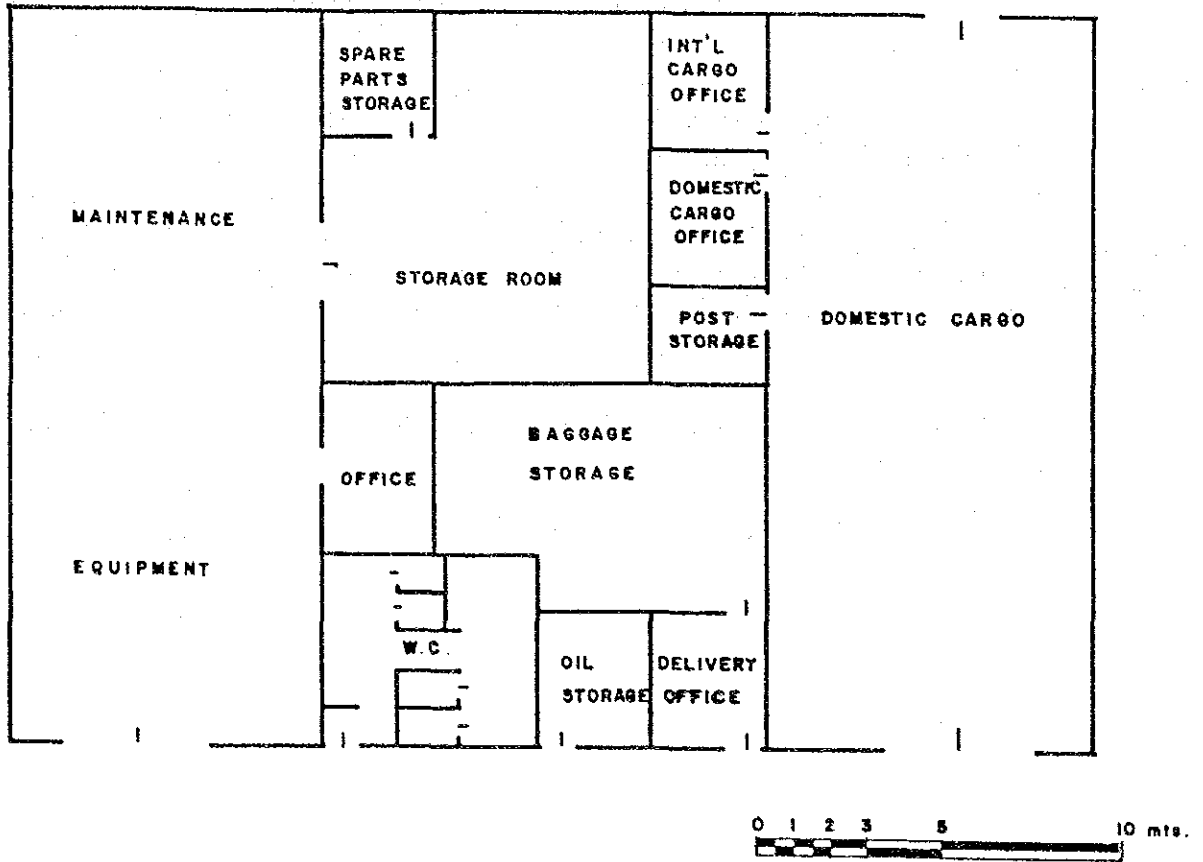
Floor Plan of LAB Cargo Terminal Building
